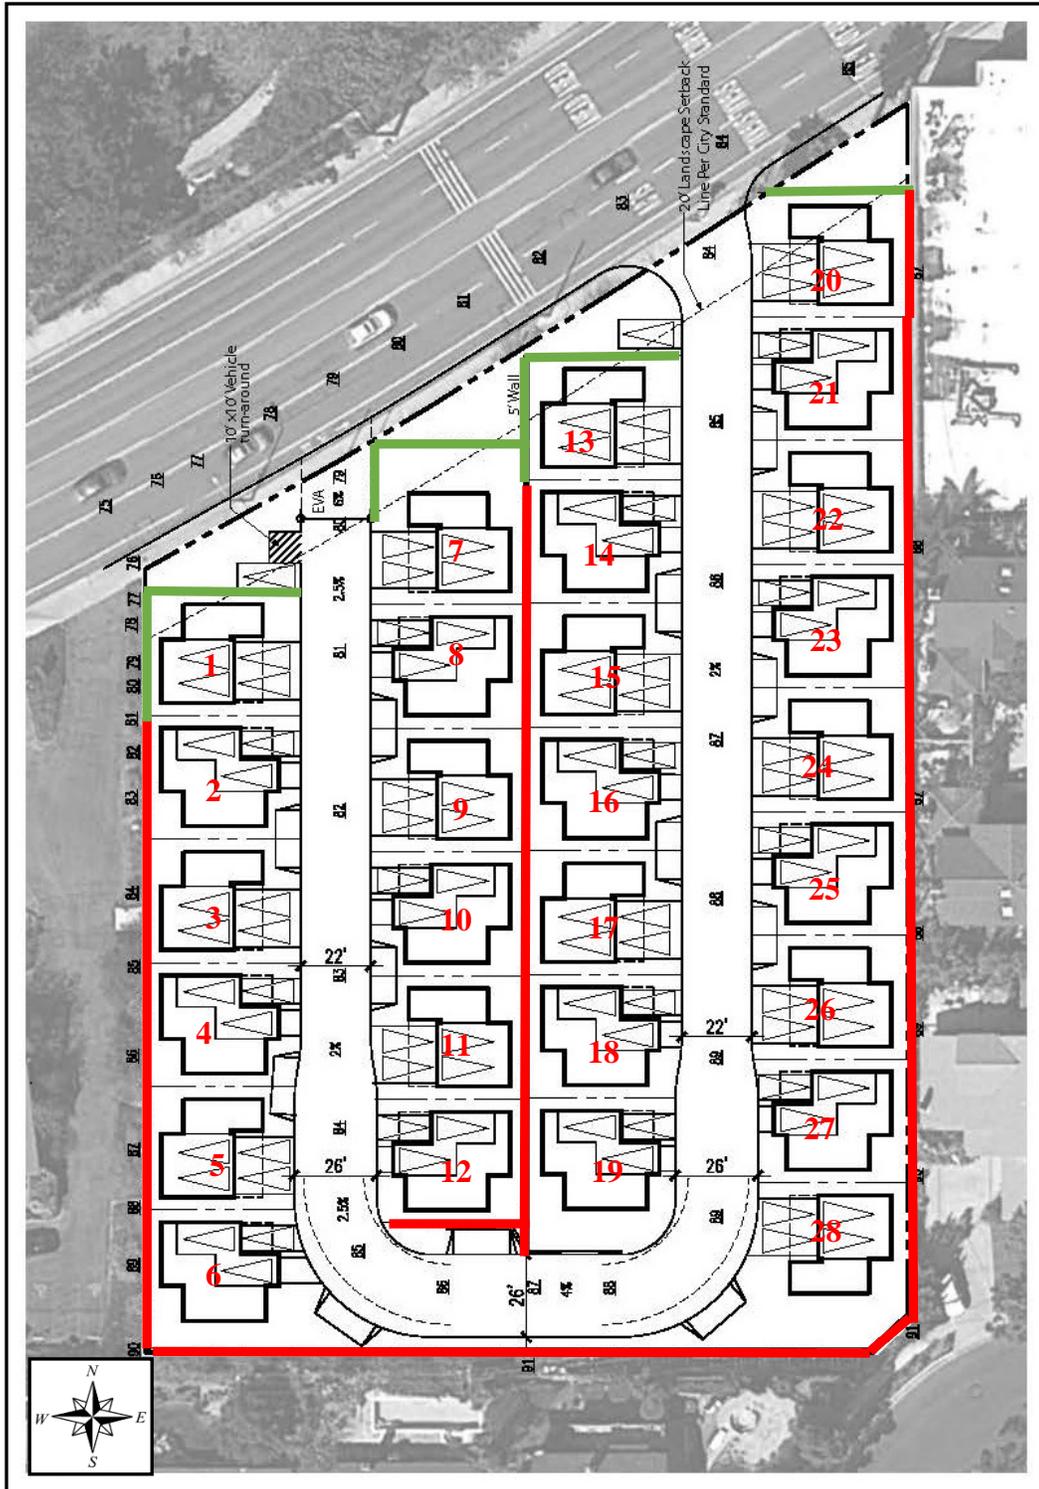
Location of the Required 8 Foot Perimeter Walls (Green Lines)
